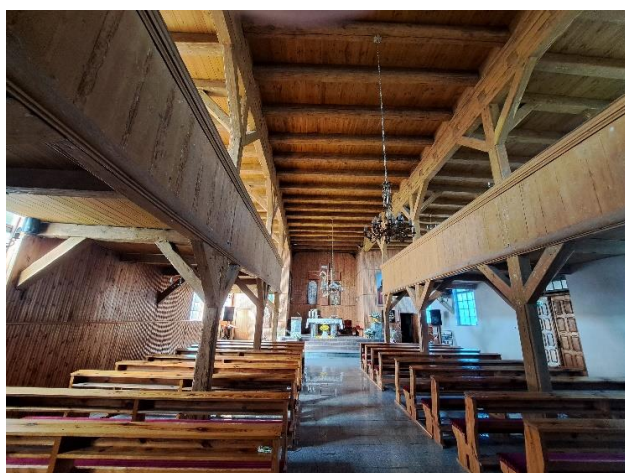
A detail of the inner space of the church (photo by B. Nowogońska)
